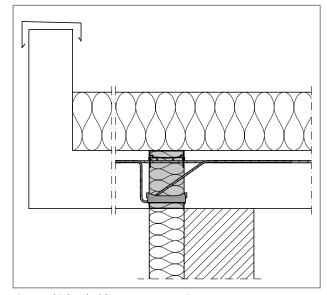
Schöck Isokorb® XT type K: Connection to a canopy
